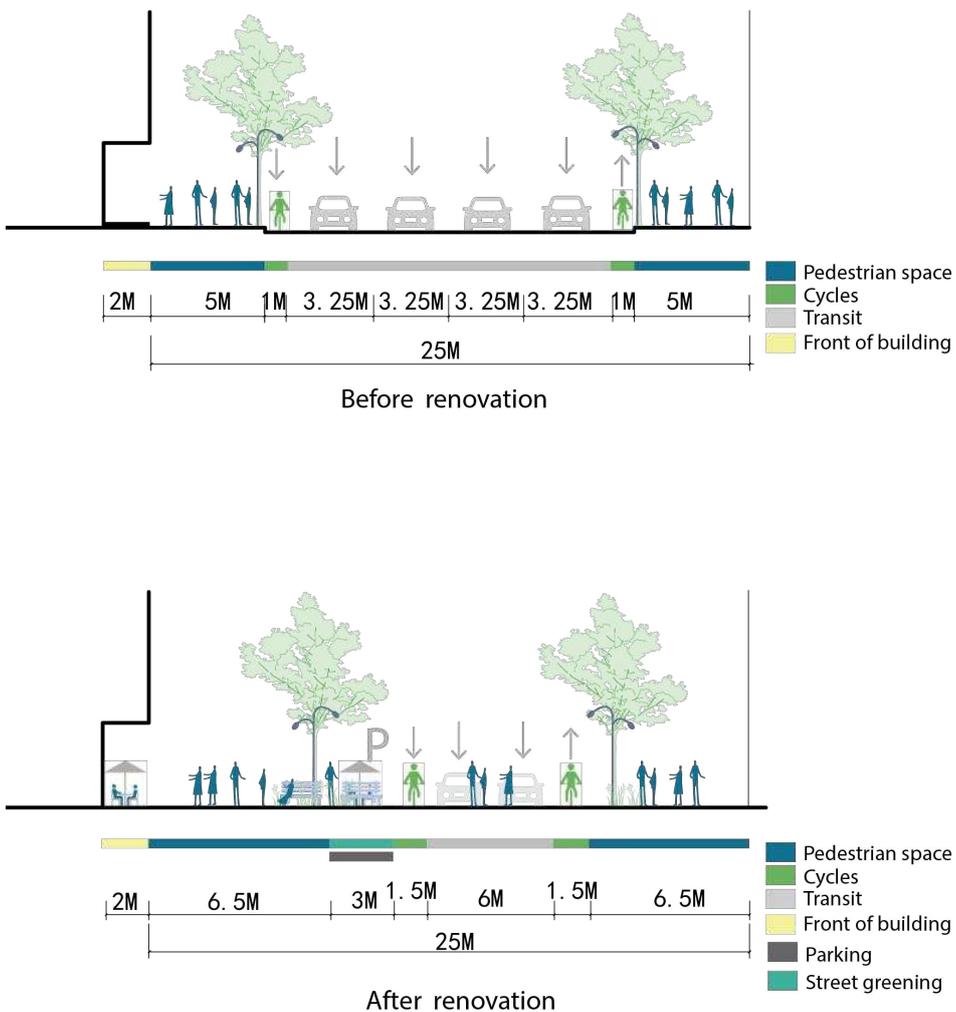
Section of Tianhe Nanyi Road before and after renovation(TeeMall part) (Source: Completed by author)
